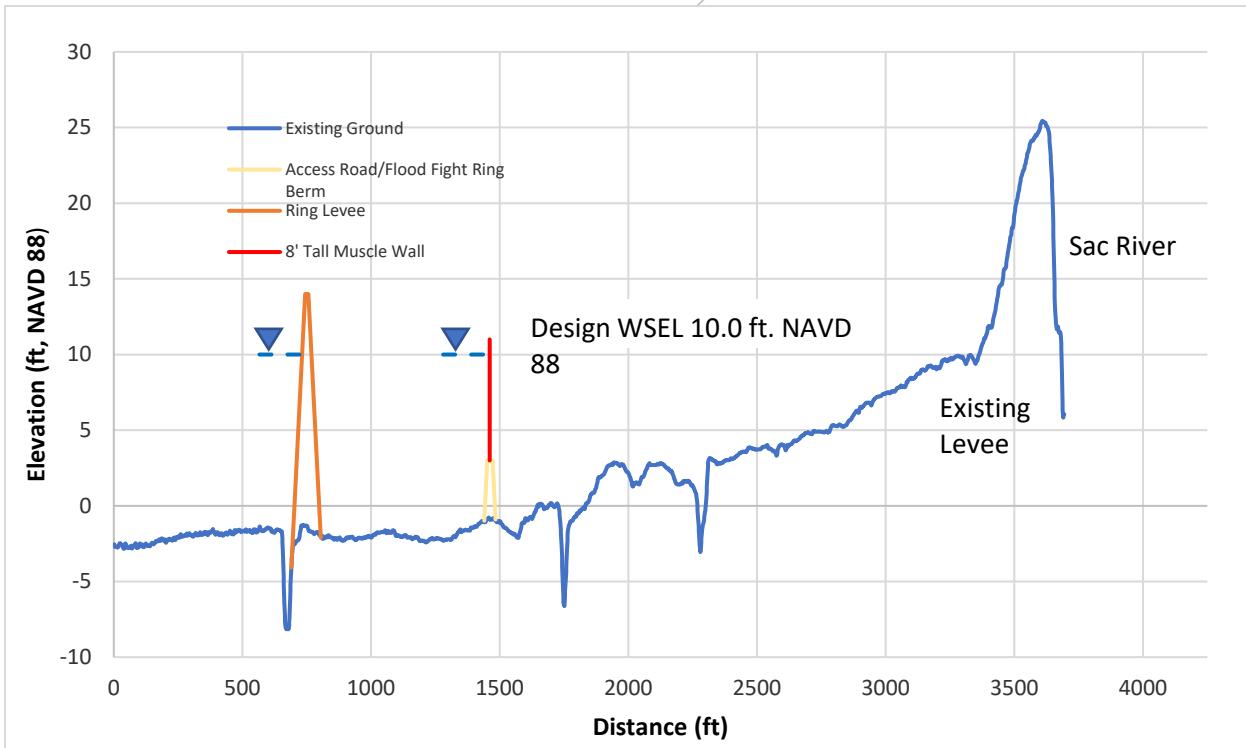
"B-B" Cross Section of Potential Flood Fight Berm and Ring Levee Systems
